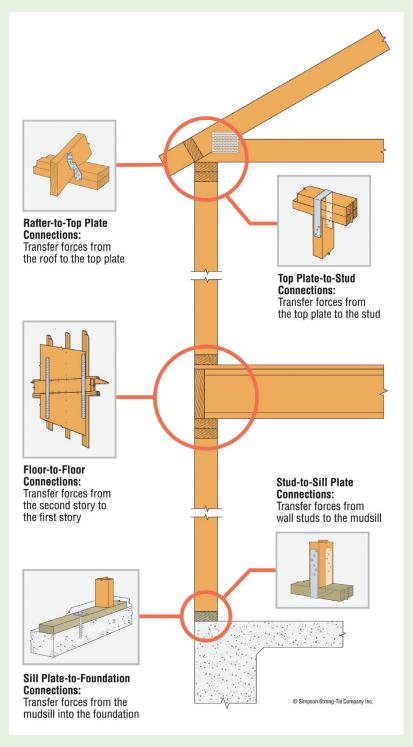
Continuous load path connection ties: (i) the roof to wall typically with hurricane clips (A) and plate ties (B); (ii) the wall of a higher story to the wall of a lower story with straps (C); and (iii) the wall to the foundation with plate ties (D and anchors (E). For a single story house, the connections at (C) are not needed. These connections are in all new houses (Table 4-1). Older homes usually will not have these features. In many cases, retrofit can easily be done for certain portions. Source: Simpson Strong-Tie
